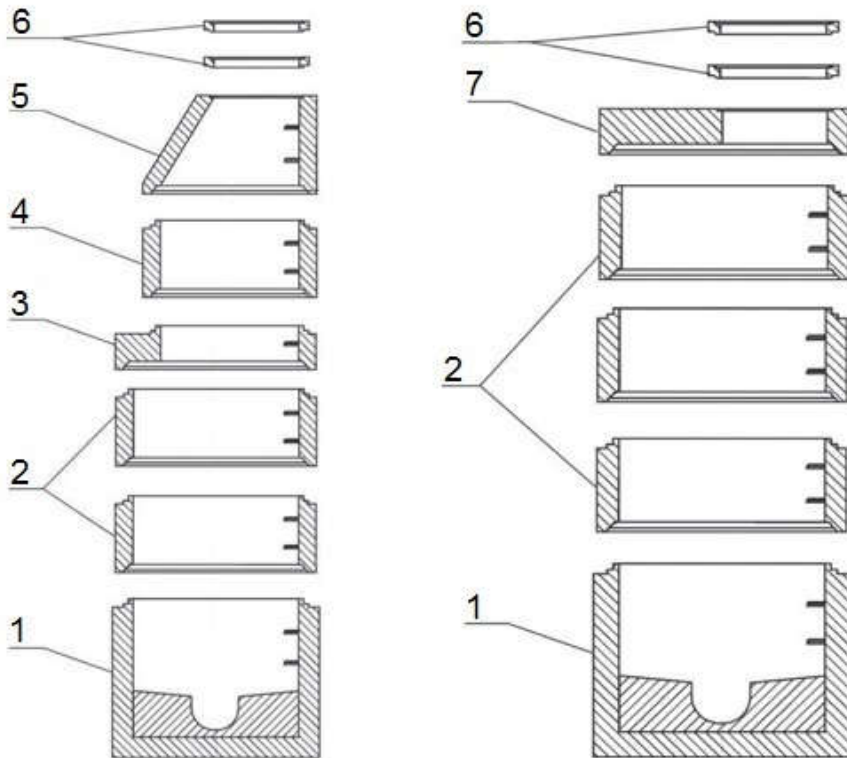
The exemplary scheme of a concrete sewerage manhole (SPEBK, 2010):
